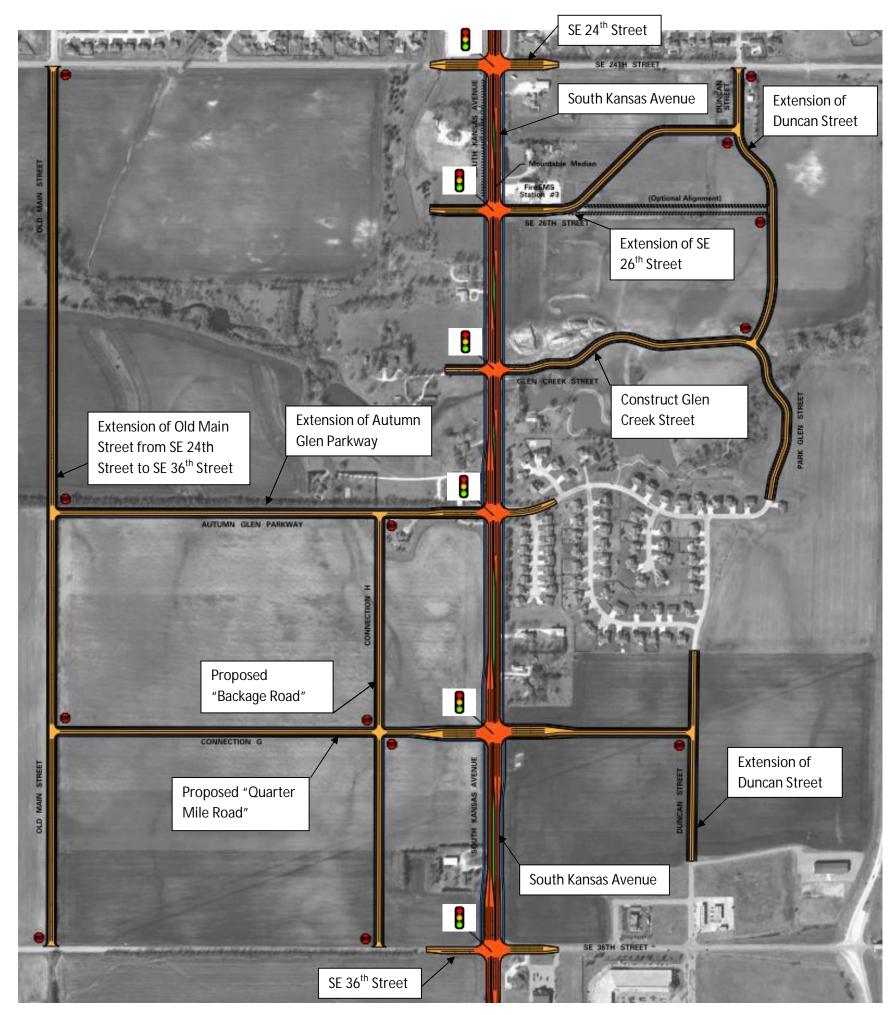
2030 Proposed Roadway Configuration Sketch
